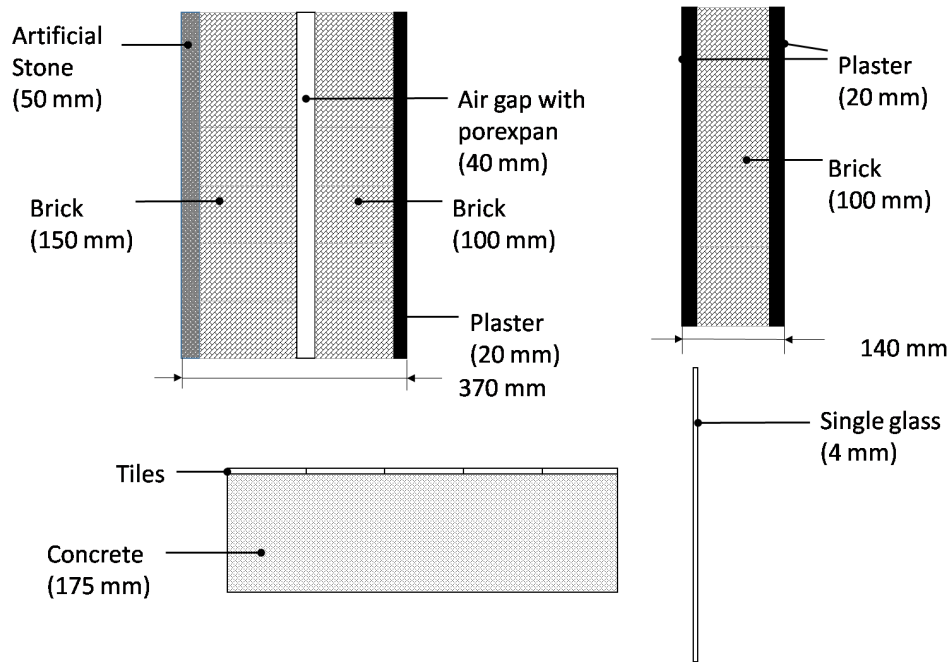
Room walls in Terrassa hospital demo site. Top Left: façade, top right: interior wall, bottom left: floor and bottom right: window.
